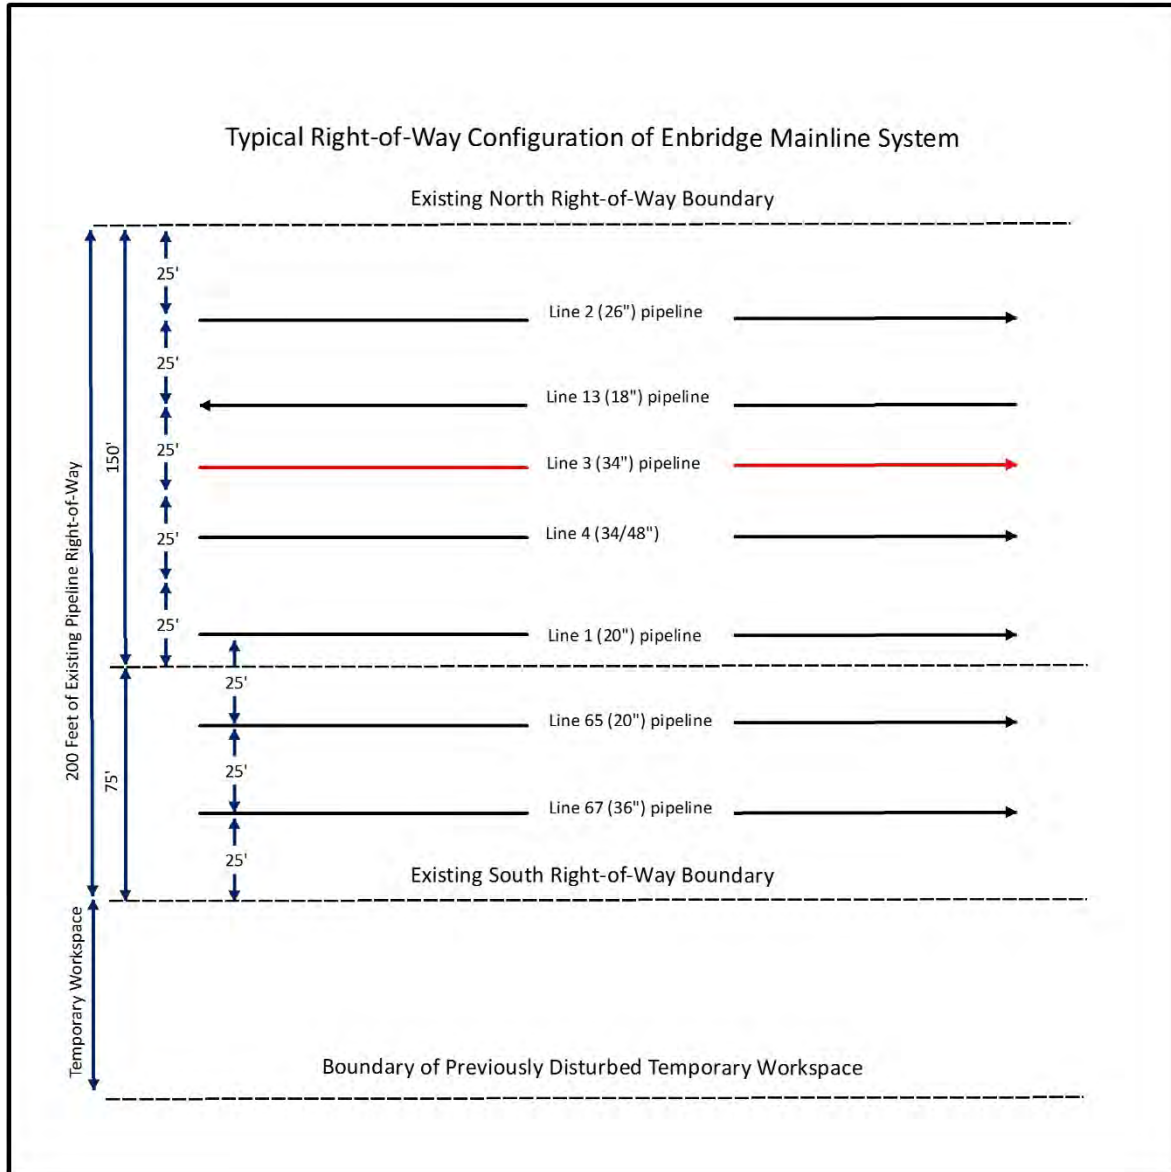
Enbridge Mainline System Right-of-Way Configuration[†]
